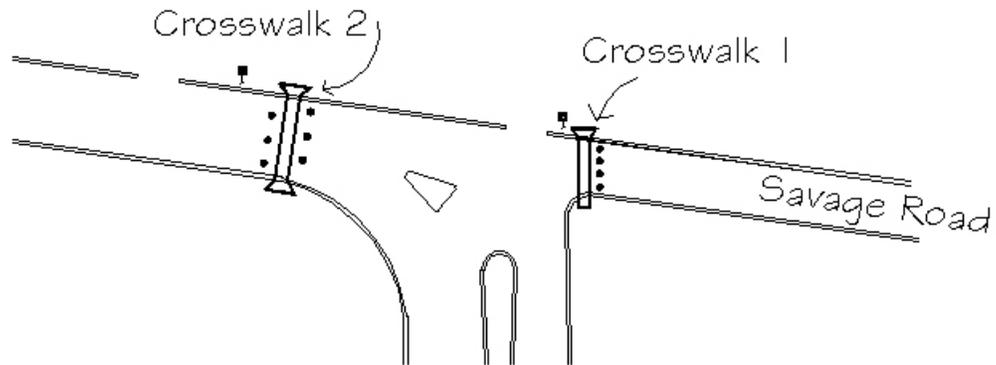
A plan showing the arrangement of the in-pavement flashing warning lights installed on the two crosswalks.
